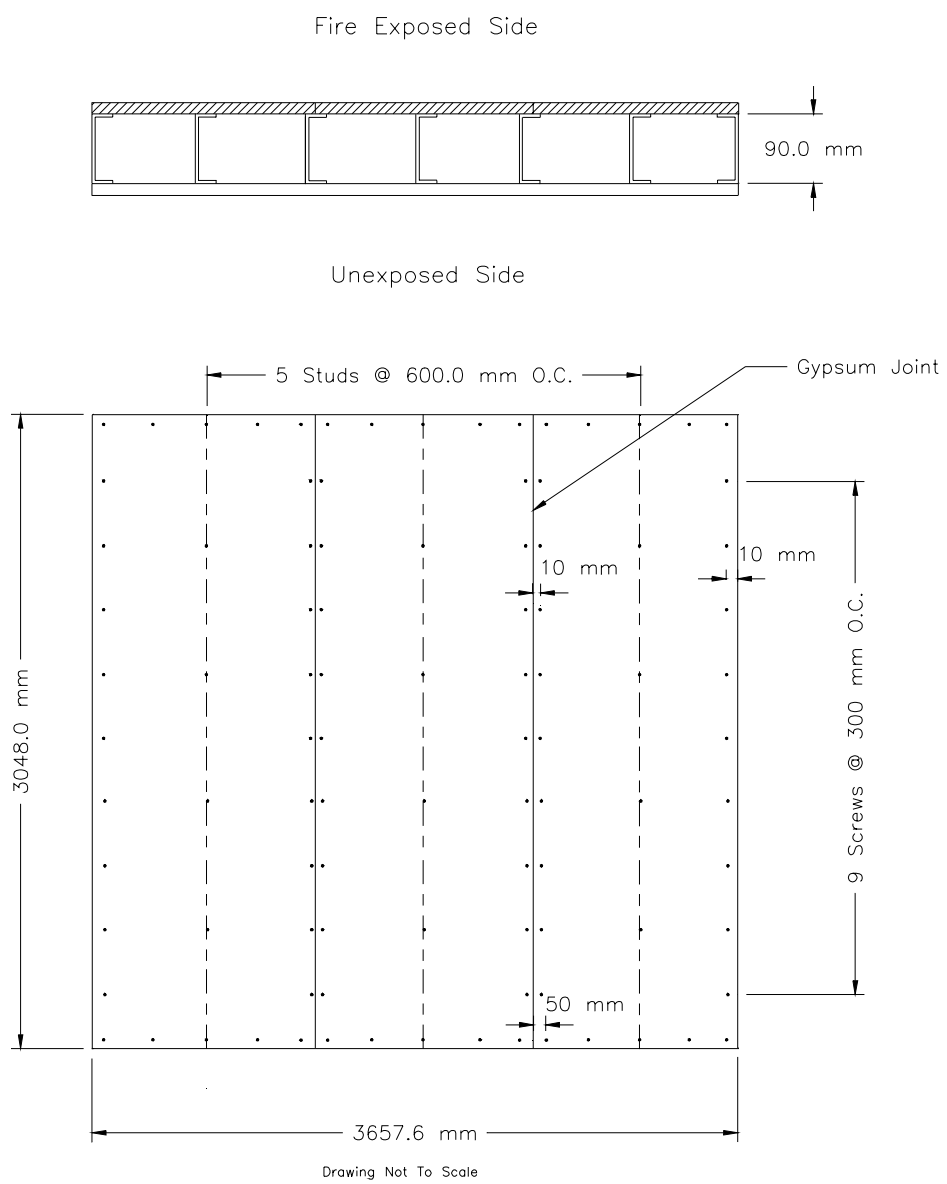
Screw Locations for Steel Stud, 1x1 Gypsum Board Layers, Full-Scale Assembly (Exposed Side)
